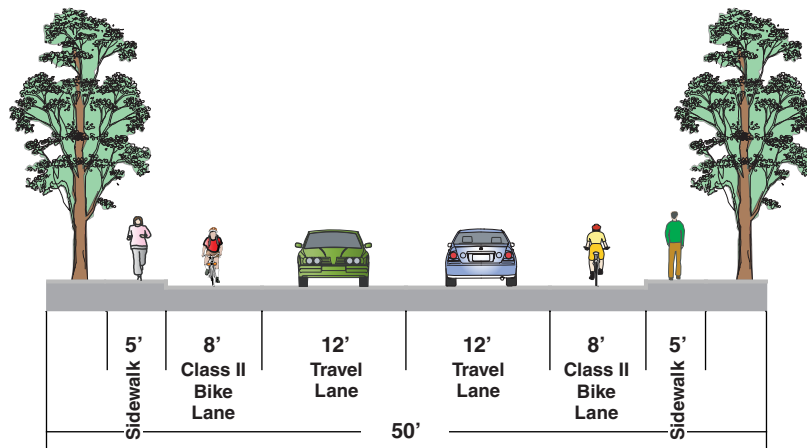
Eastside Parkway - Typical Two Lane Street Section with Sidewalks
